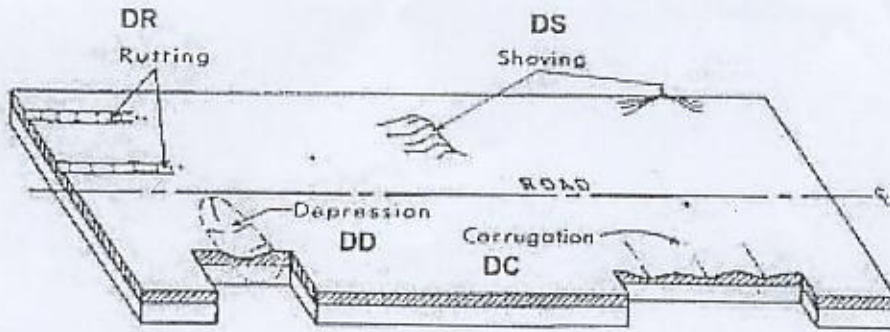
DEFORMATION DEFECTS IN FLEXIBLE PAVEMENTS
